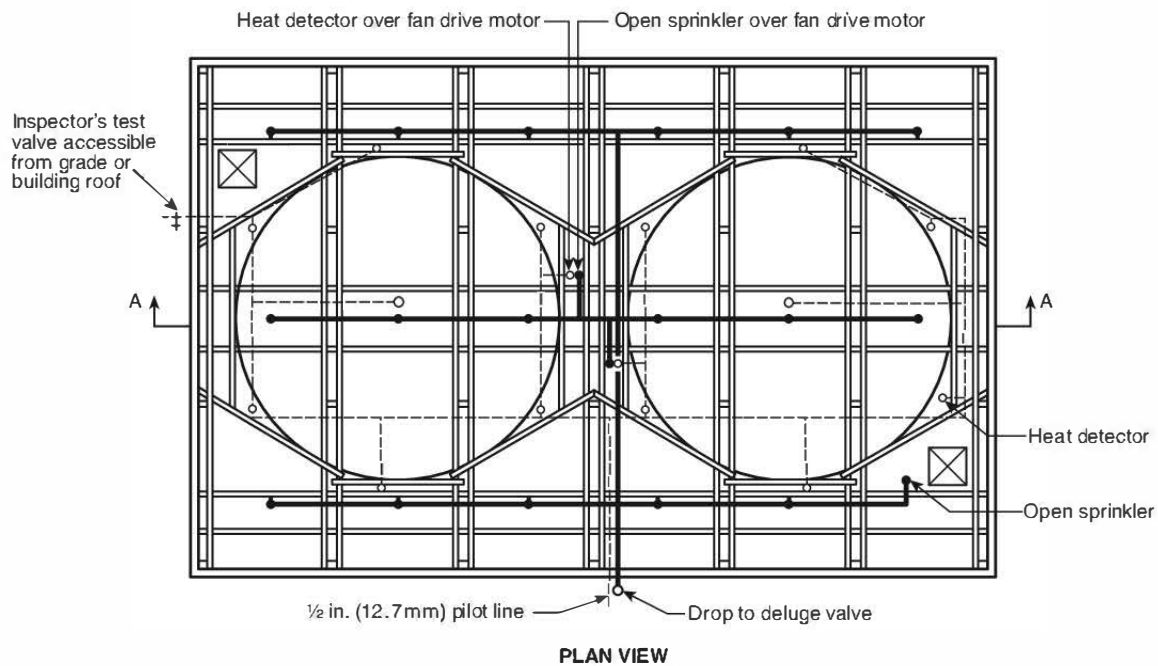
(a) Plan View, Typical Deluge Fire Protection Arrangement for Counterflow Towers.
